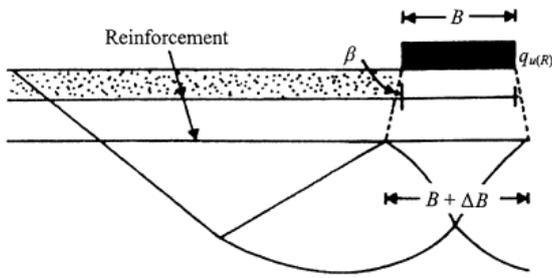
Failure mechanism the Wide-slab of reinforced soil under the foundation strip.
